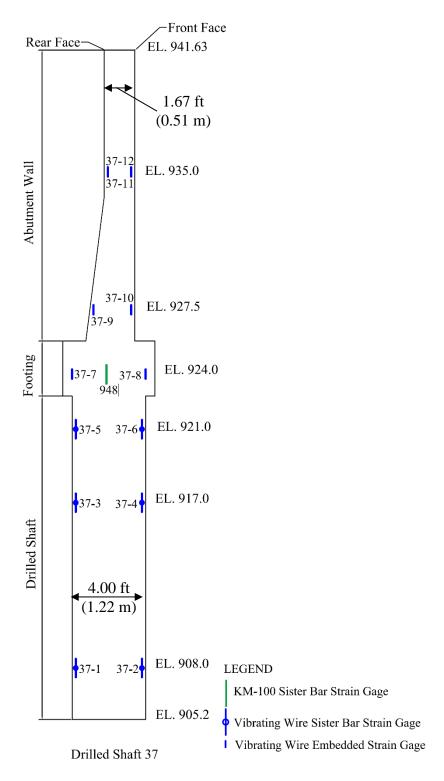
Gage locations in Drilled Shaft 37, footing, and abutment wall (EL in ft: 1 ft = 0.305 m).
